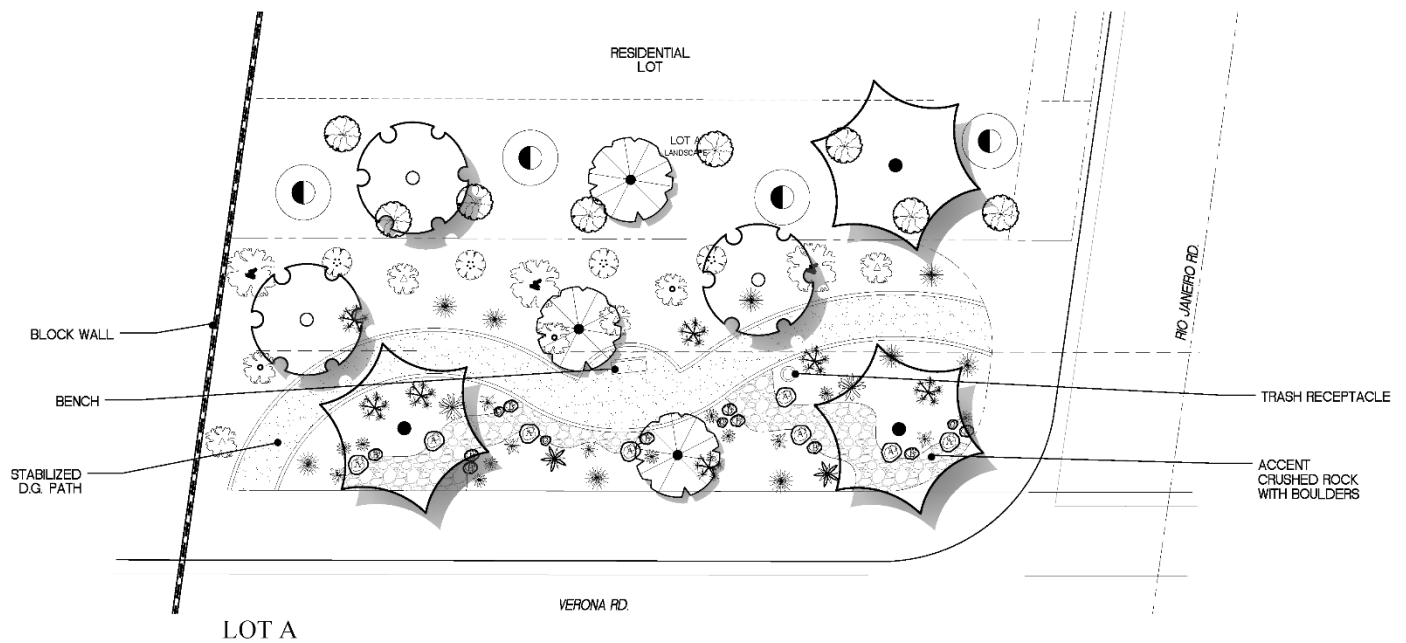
I.3 Conceptual Boulevard Parkway Park (As Amended 2024)
